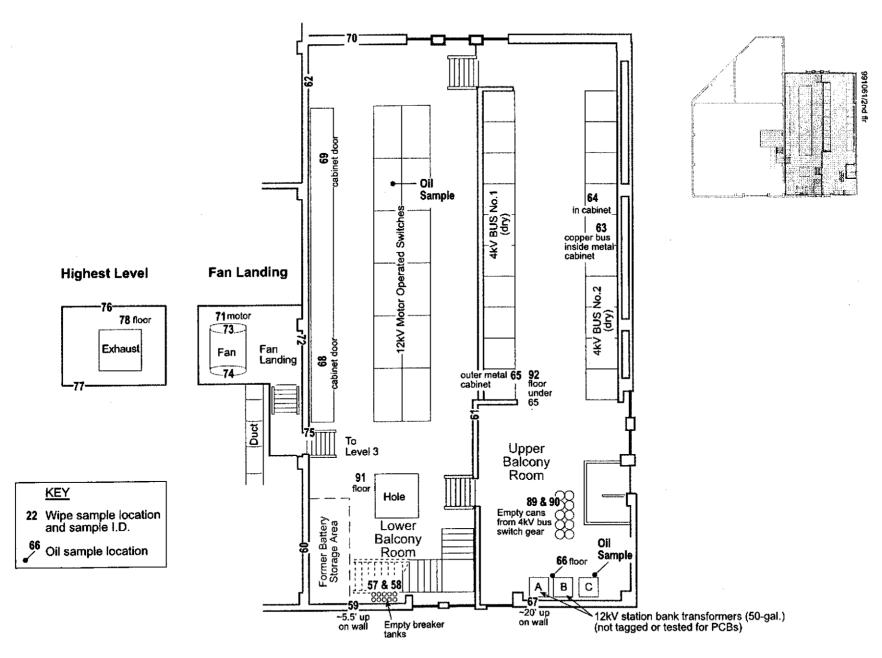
Wipe and oil sample locations on second floor of Piedmont Substation "E", October 19, 1999.
